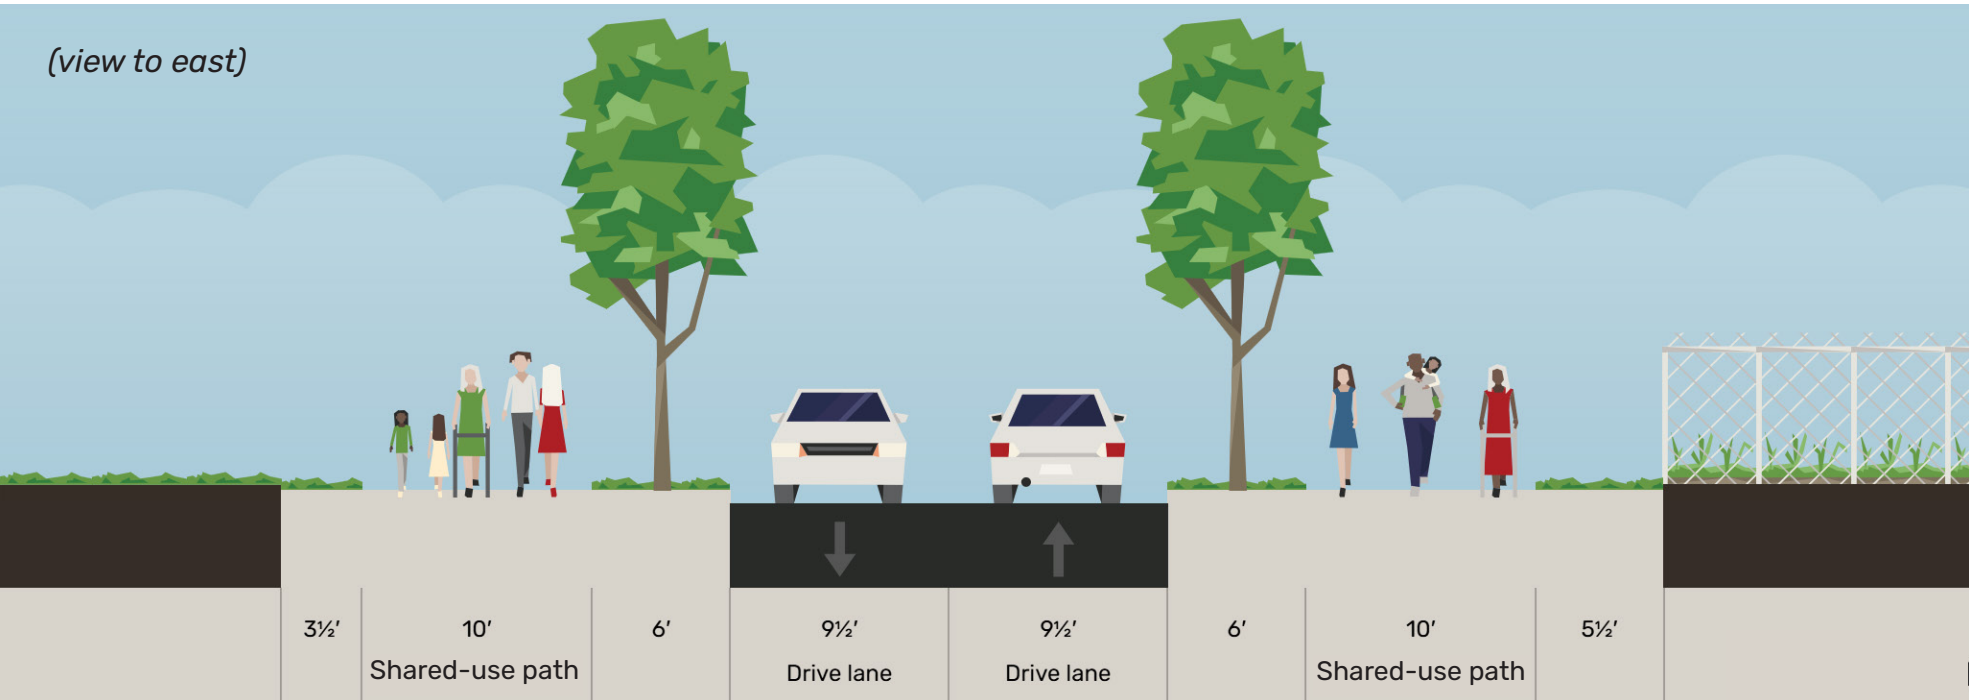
Proposed Typical Cross-Section on Silver Meadow Lane (60' ROW)
